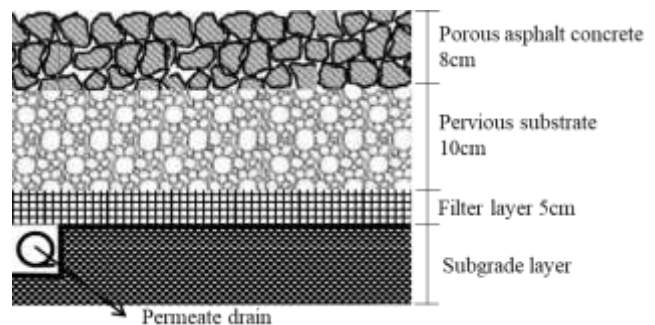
Sidewalk drainage section (CPAMI, 2015)
